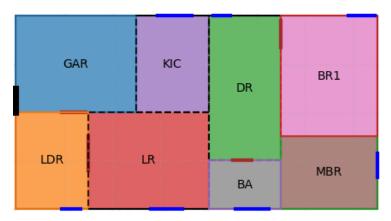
Final floor plan with windows and doors. (Bold blue lines are windows; bold brown lines are doors)
